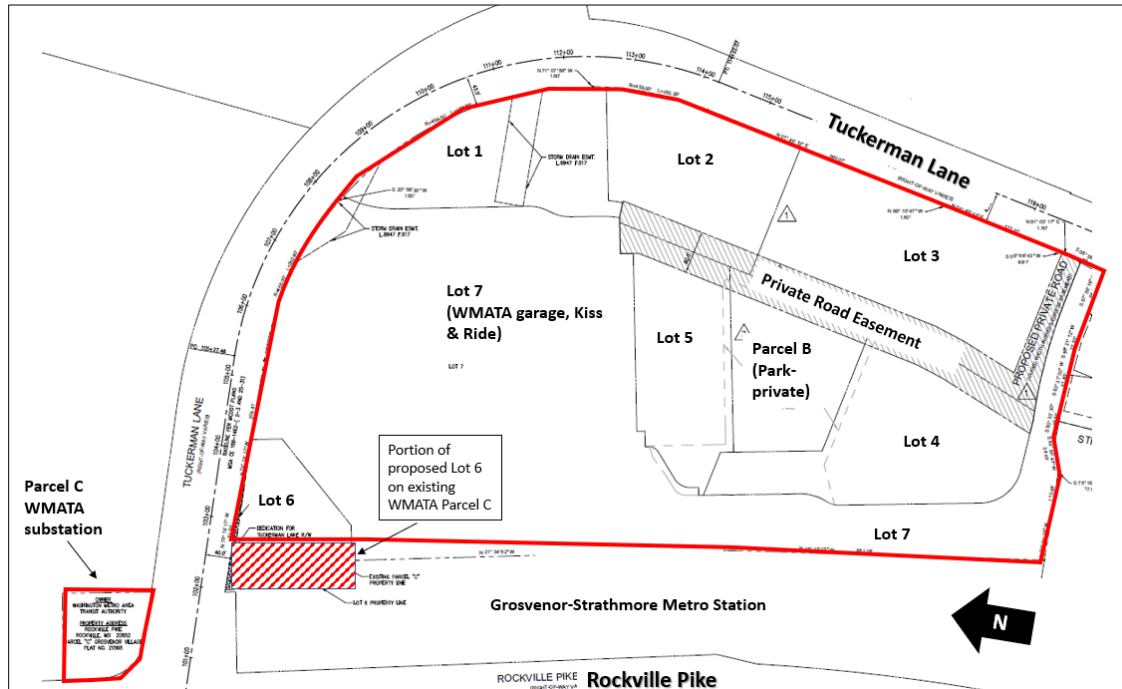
Approved Preliminary Plan No. 12019018B lotting diagram
